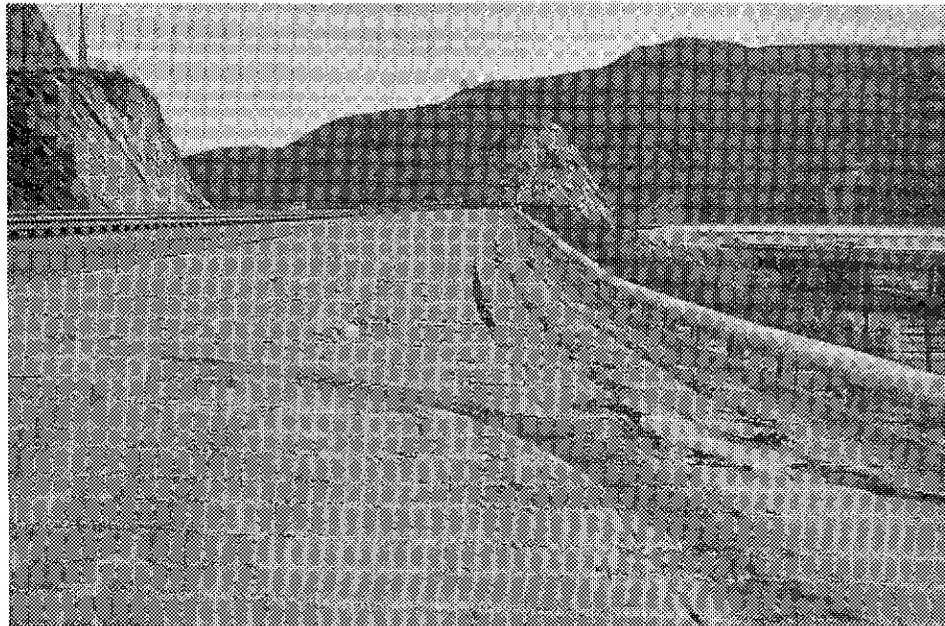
Longitudinal cracking in pavement due to lateral movement at top of cantilever retaining wall. Pavement has been broken mechanically for removal.
